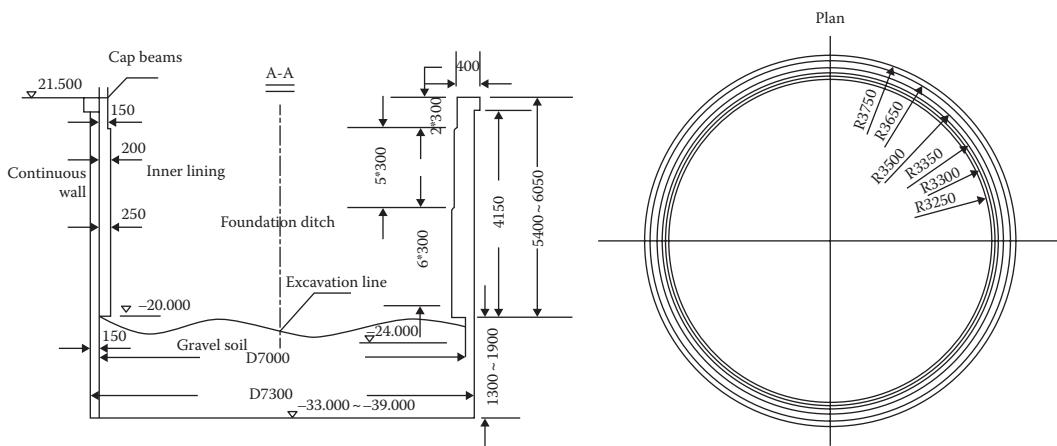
Shoring structure layout of south anchorage, Yangluo Bridge. (From Xu, G.P., *Highway*, 5, 2009.)
